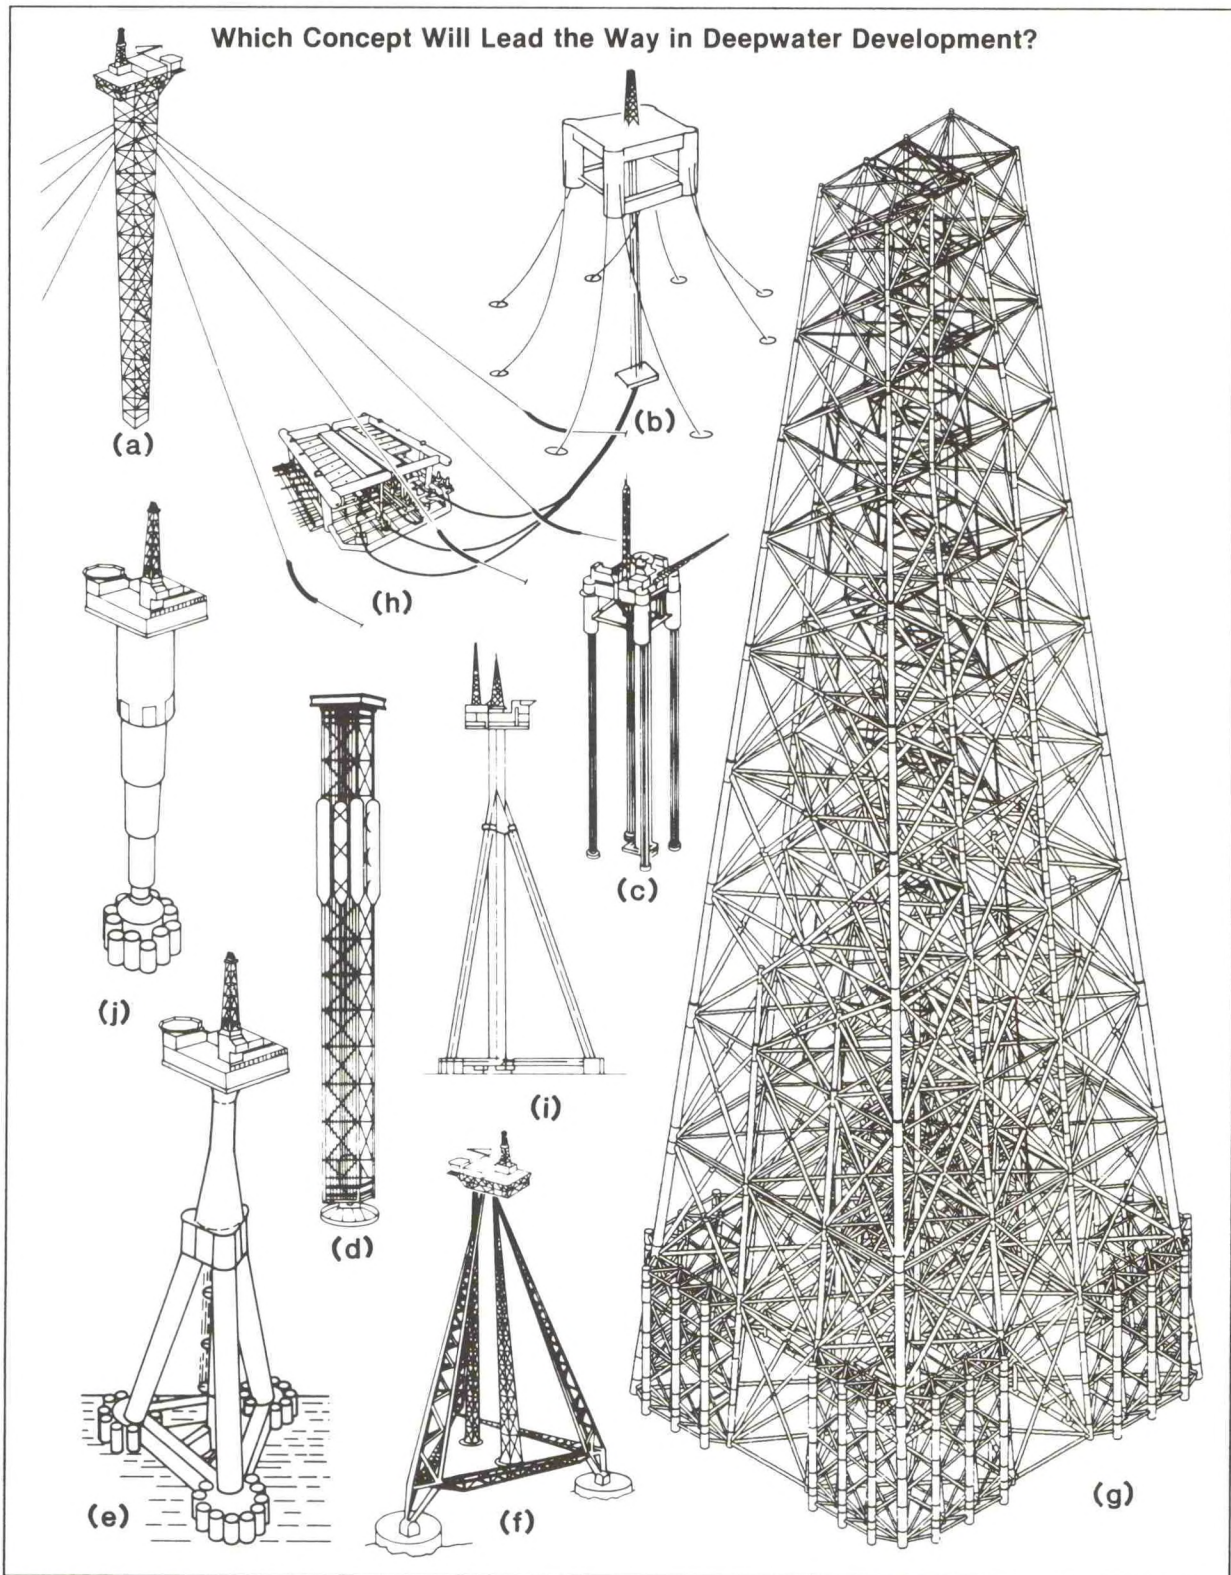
Structural concepts for deepwater platforms: (a) Guyed Tower, (b) Floating Production System, (c) Tension Leg Platform, (d) Articulated Compliant Tower, (e) Rigid Concrete Tripod Structure, (f) Steel Tripod Structure, (g) Rigid Steel Jacket, (h) Subsea Production System, (i) Steel Box Tripod Structure, (j) Solid Compliant Tower (figure courtesy of McDermott International).
